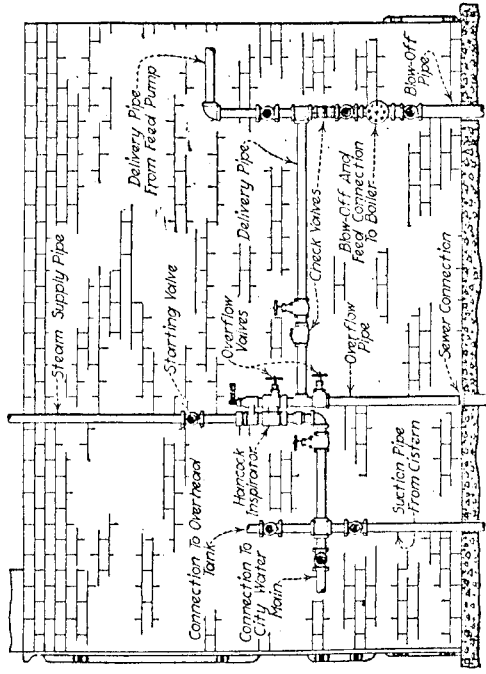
An inspirator type of injector piped for boiler feeding.
